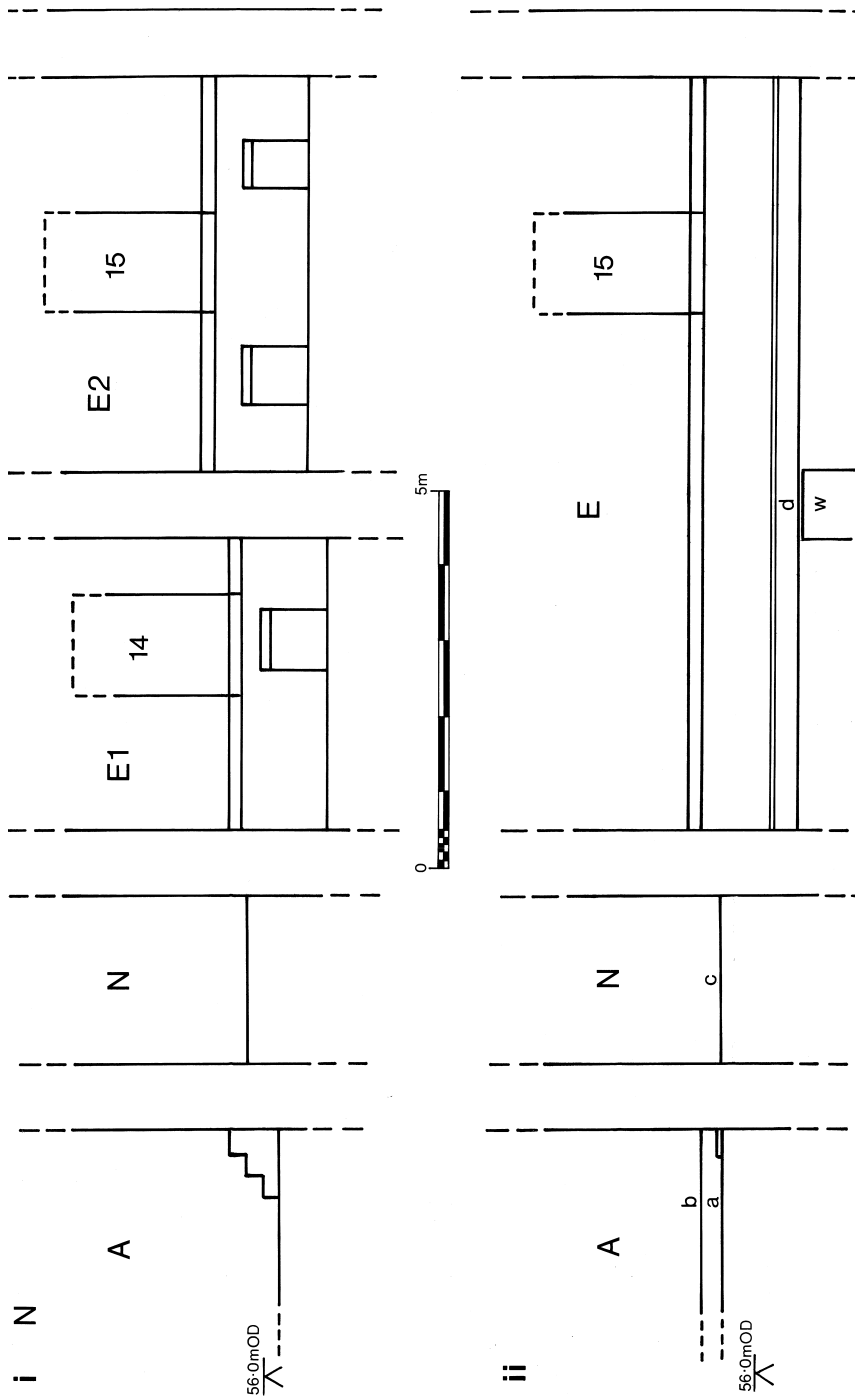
i (top) Elevation through the centre of the western range of rooms in Period 1, showing basement floor and suspended floors in E1 and E2, underfloor vents in medial wall, doors 14 and 15 (heights unknown). Also shown, upper surface of primary floors in lobby N and changing room A (area beneath unexcavated). Scale 1:100.
